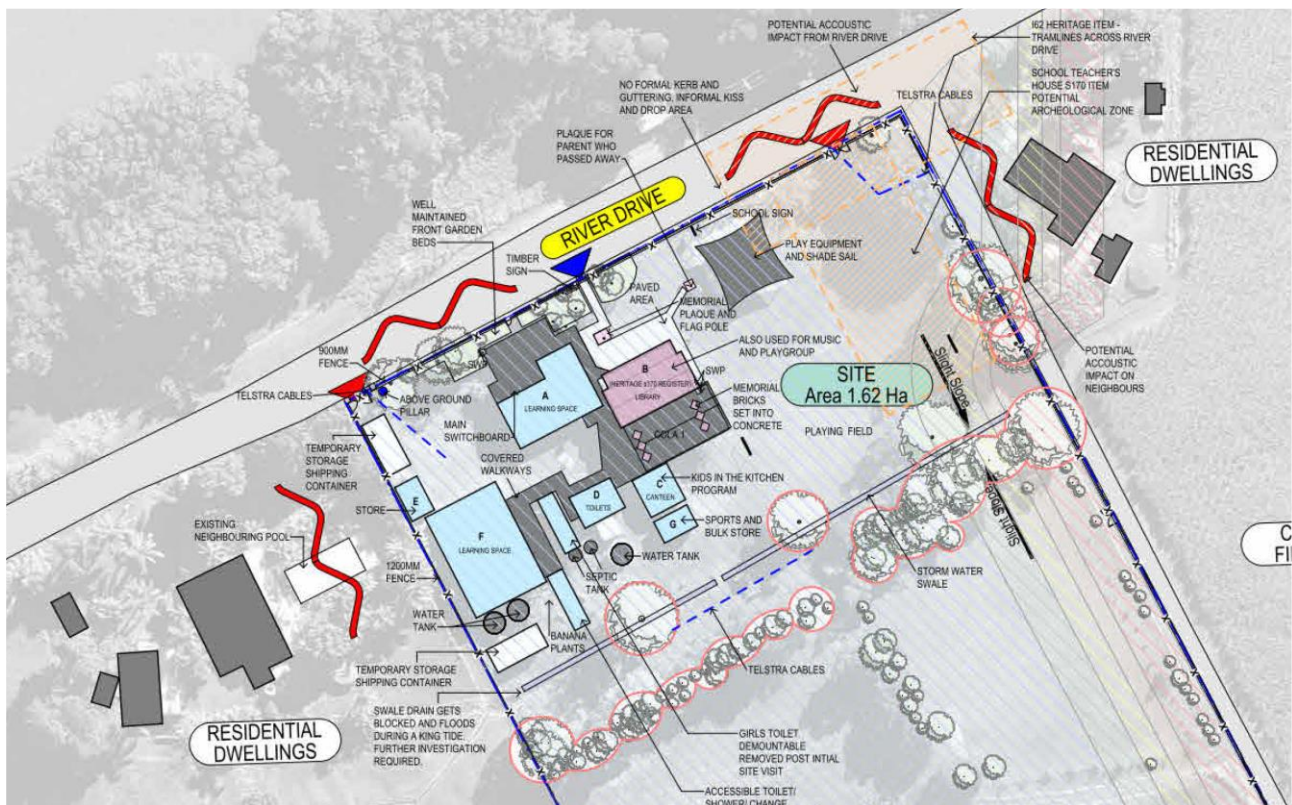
Existing Site Plan (Source: Pedavoli Architects)
